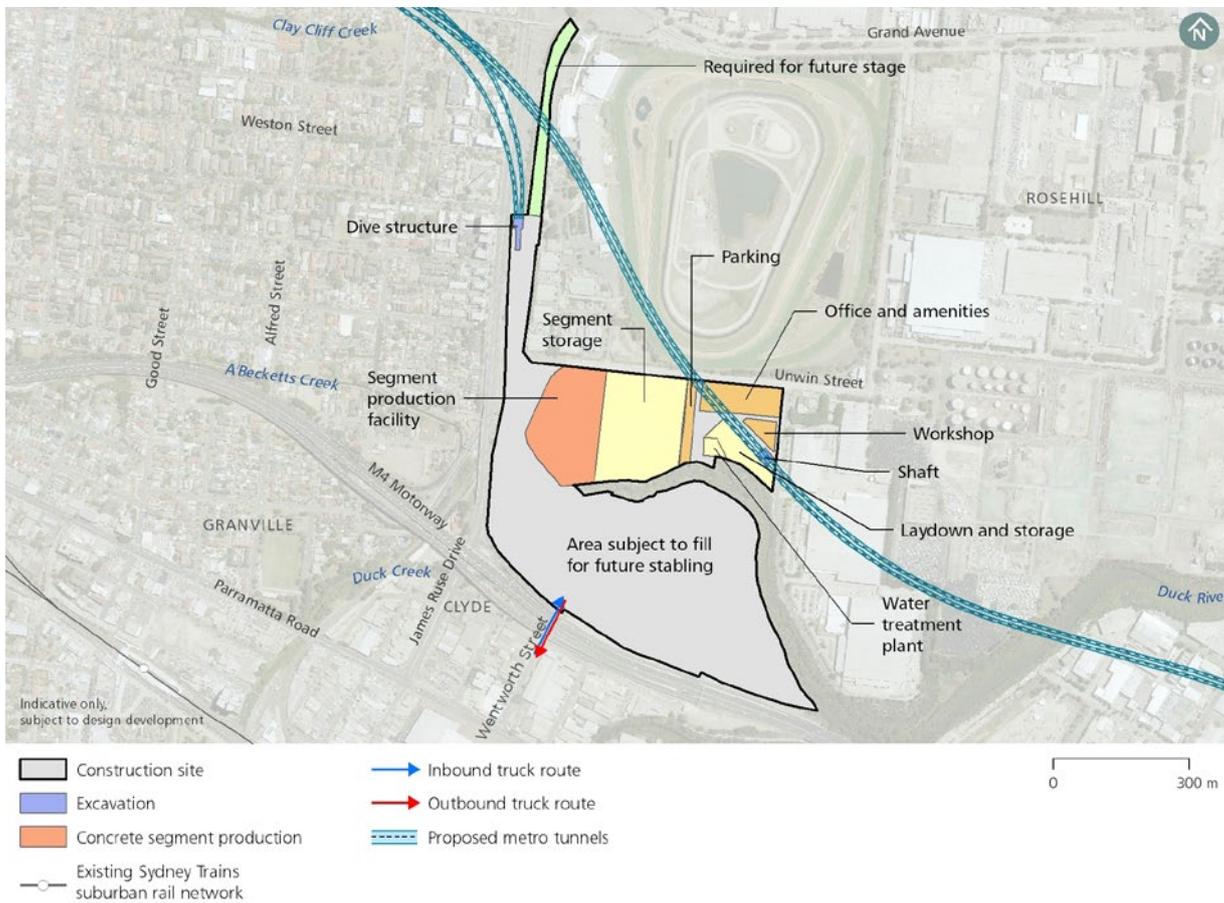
Exhibited Clyde stabling and maintenance facility indicative construction site layout
